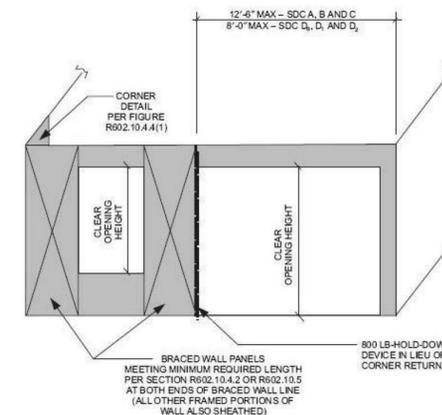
(5) BRACED WALL LINE WITH CONTINUOUS SHEATHING—FIRST BRACED WALL PANEL AWAY FROM END OF WALL LINE WITH HOLD-DOWN
